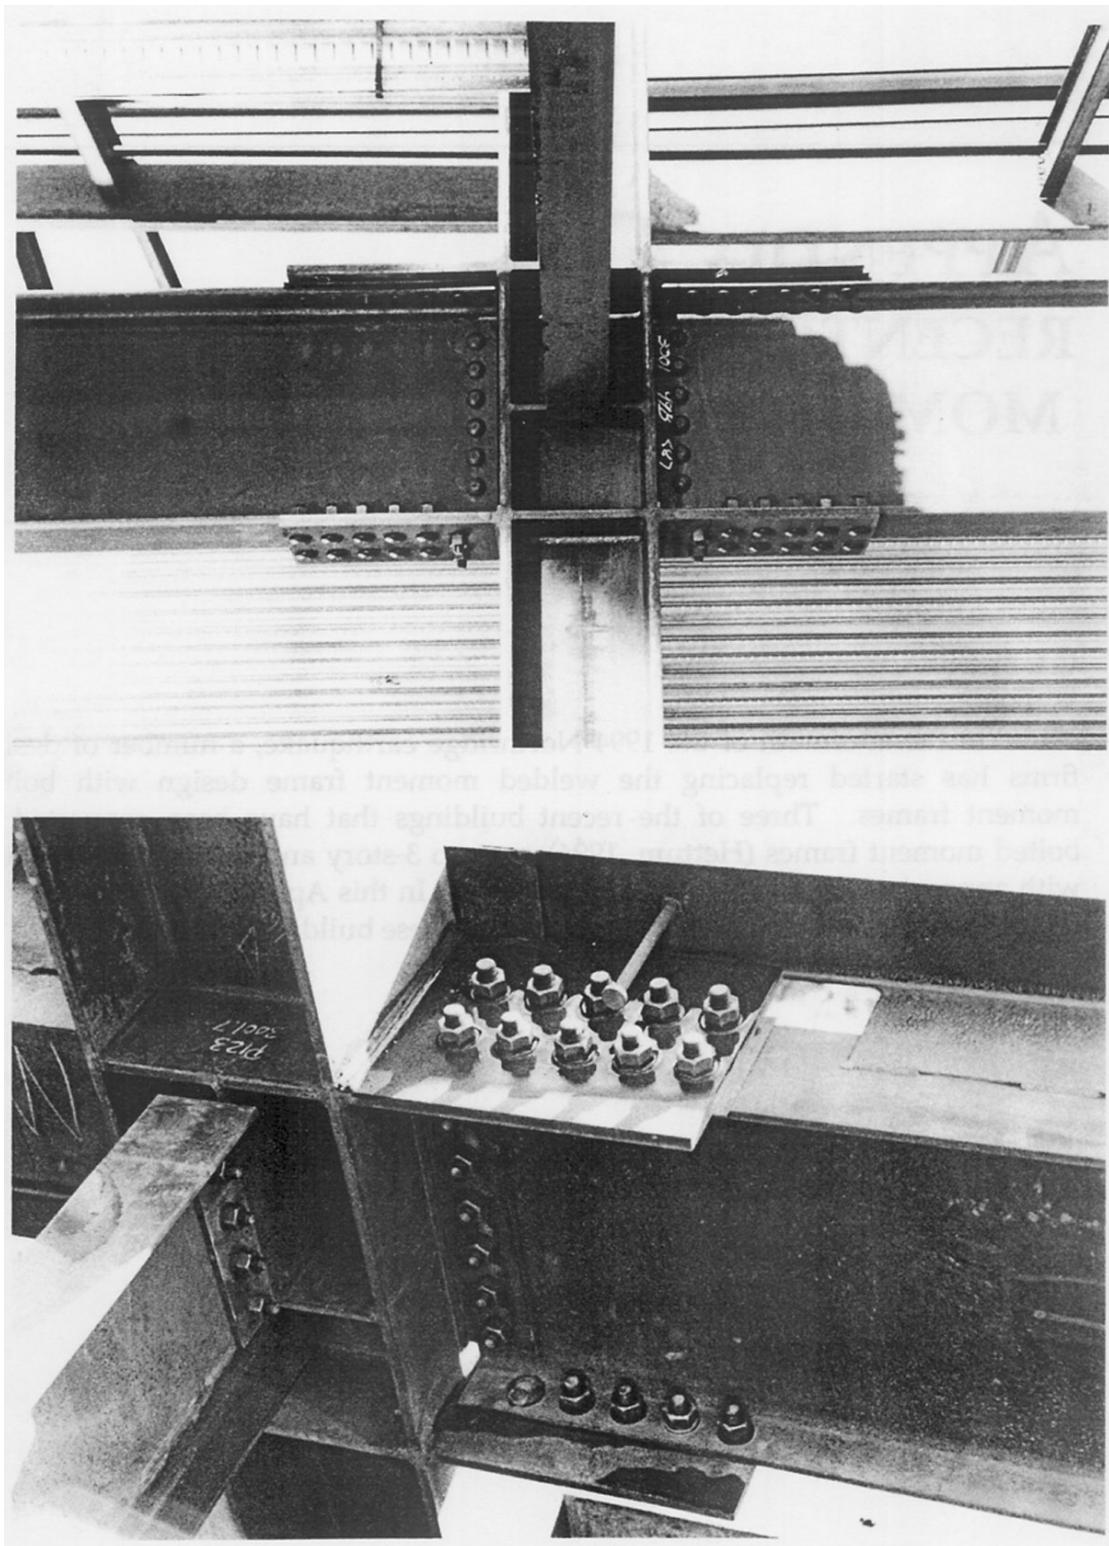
Views of Bolted Connections in Recently Designed and Constructed Structures, Courtesy of Mackenzie Engineering Incorporated, (Hettum, 1994)
